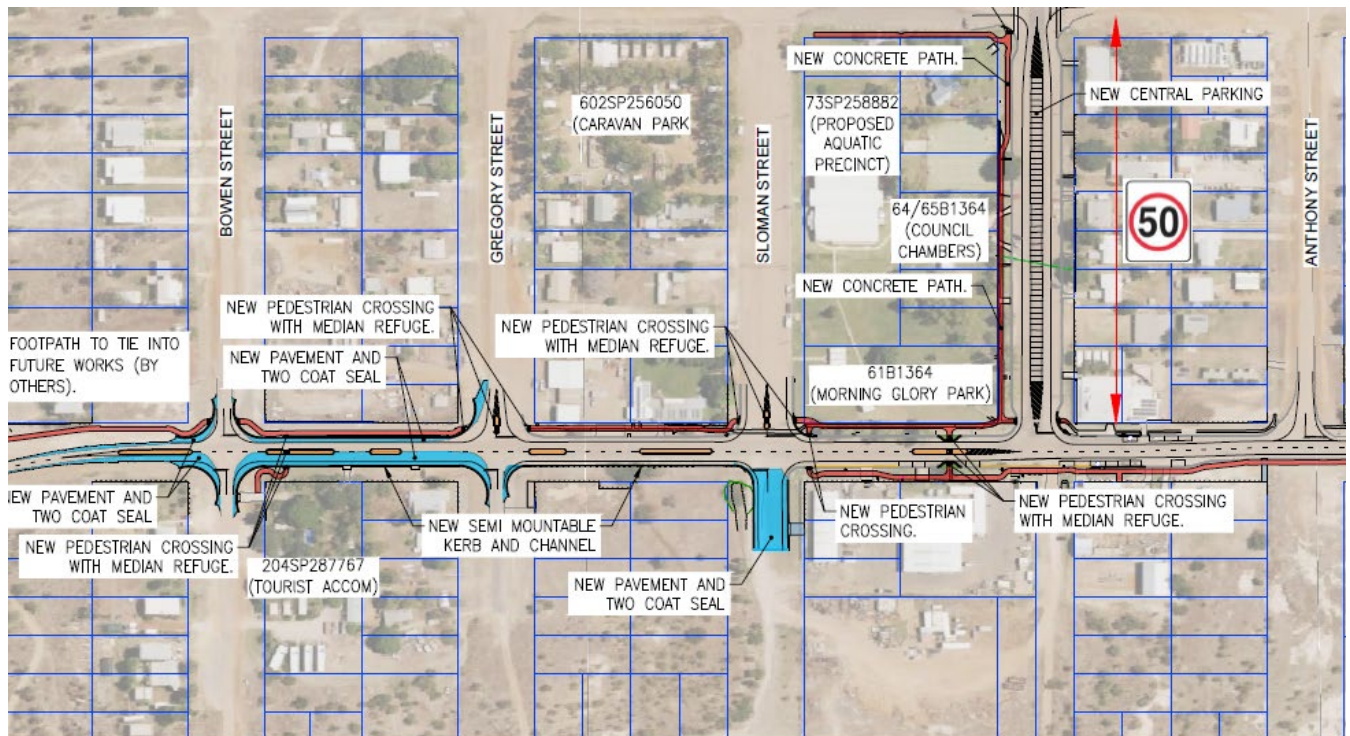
(a): Layout of the proposed Pedestrian and Cycleway Path works along Beames St and Musgrave St
